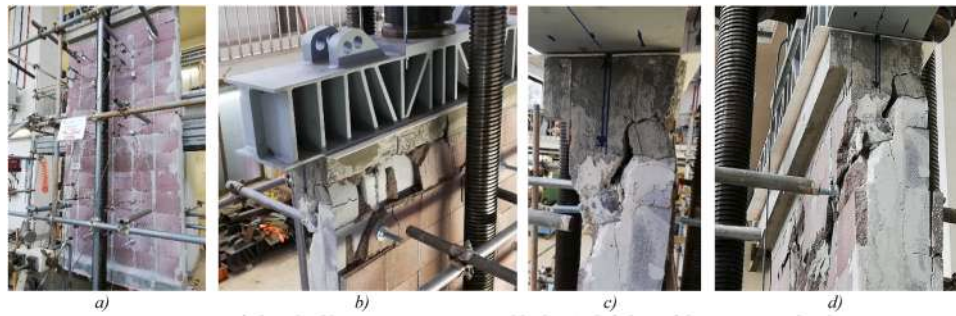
Out-of-plane buckling tests: a) test's assembly, b), c), d) failure of the specimens, details.
